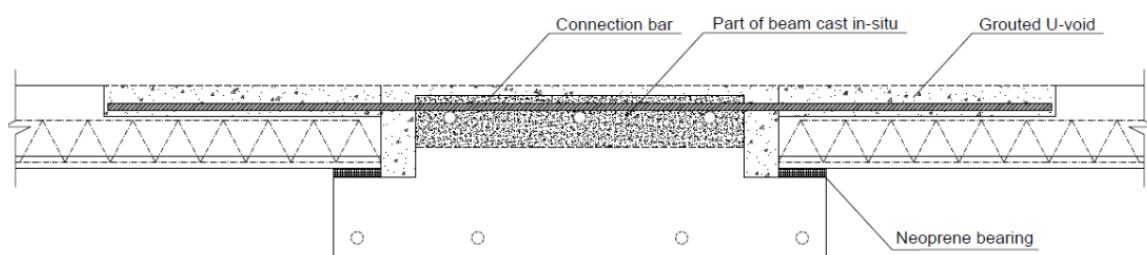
Design proposal for reconnecting wide-slab floor with a new poured beam (Volkov, 2019)
